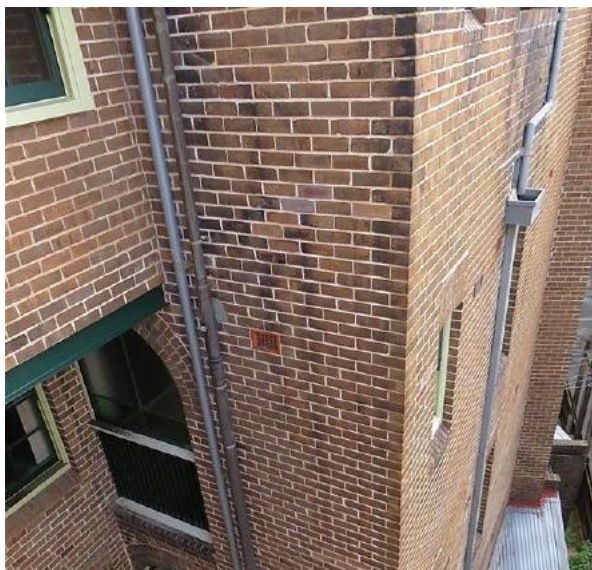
Flat 52A / 46–56 Gloucester Street. Original cantilevered section of the second floor, and original triple-brick arched opening to former porch in rear wing at first floor level, infilled with window and solid balustrade. (Source: GML Heritage, July 2016)
